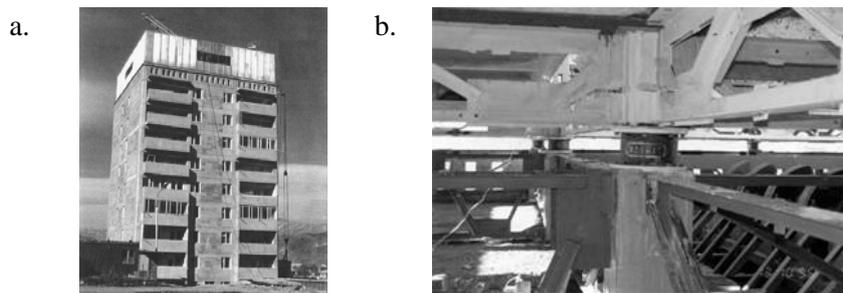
General view of a nine-story apartment building protected with AIUF (roof isolation) in Vanadzor (a) and a fragment of its connection with the building (b)
